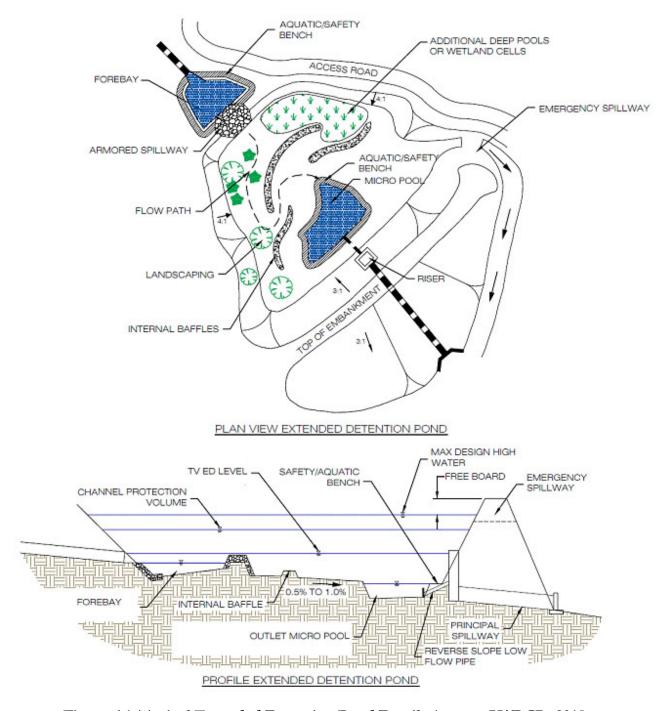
Typical Extended Detention Pond Details (source: VADCR, 2011)
